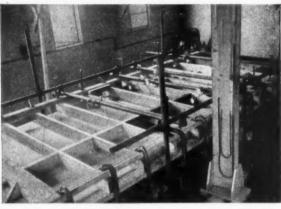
Rig for static loading tests. (Floor section is inverted, with captive airbag beneath for loading.)
